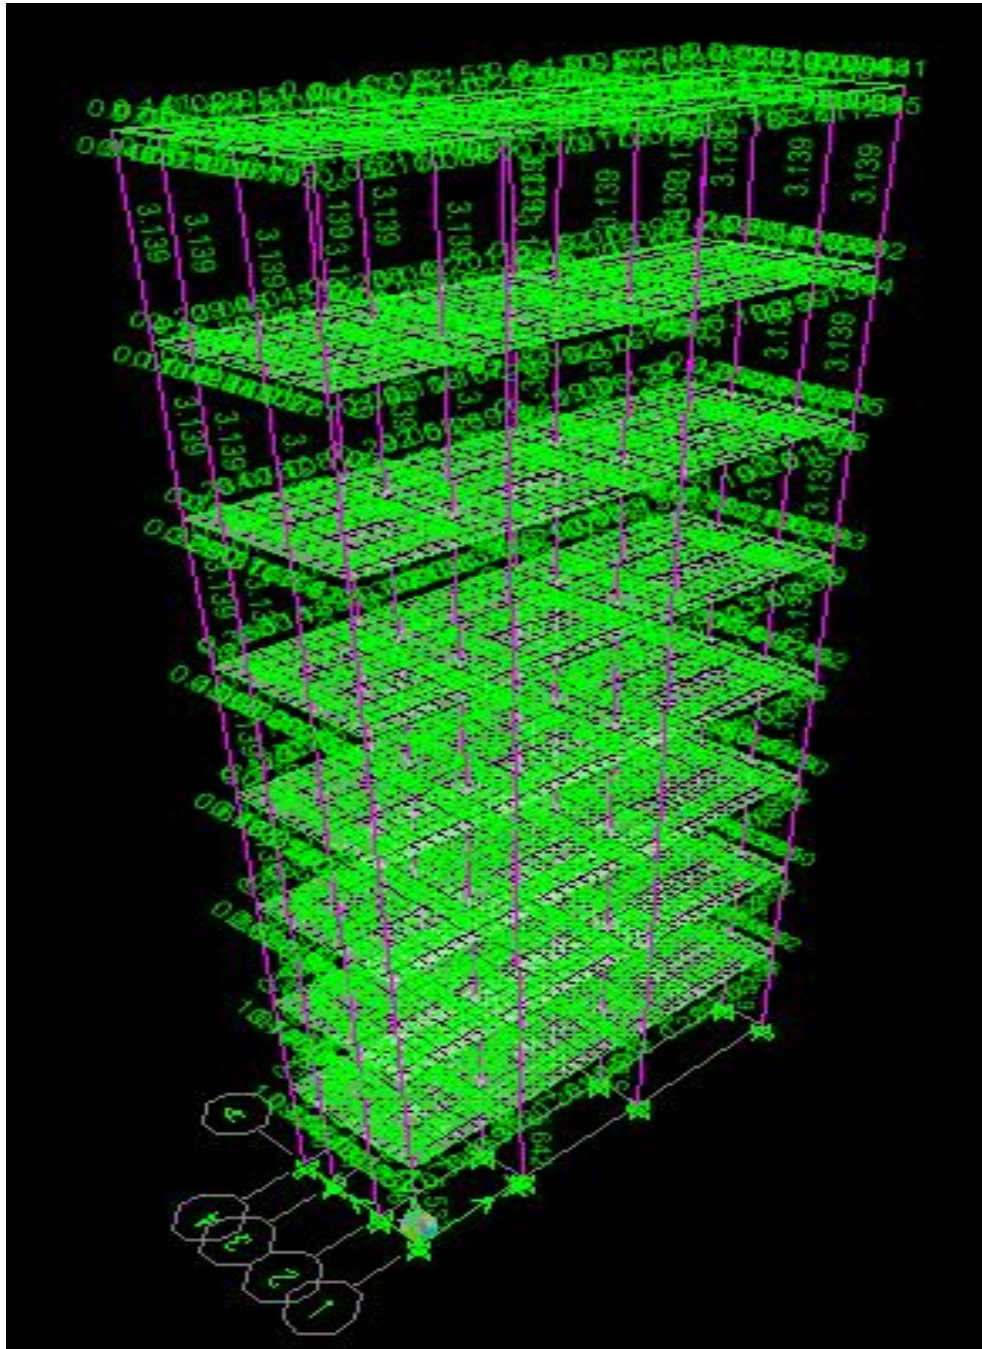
ETABS model of 8 storied building with longitudinal reinforcement
